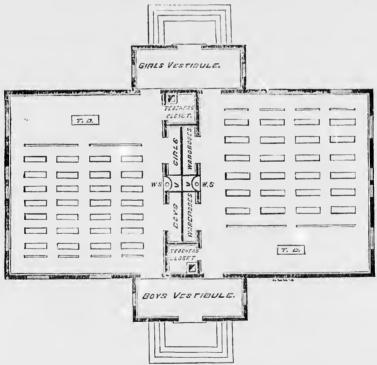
Ground Plan, adapted, with modifications, to Fig. 103.
